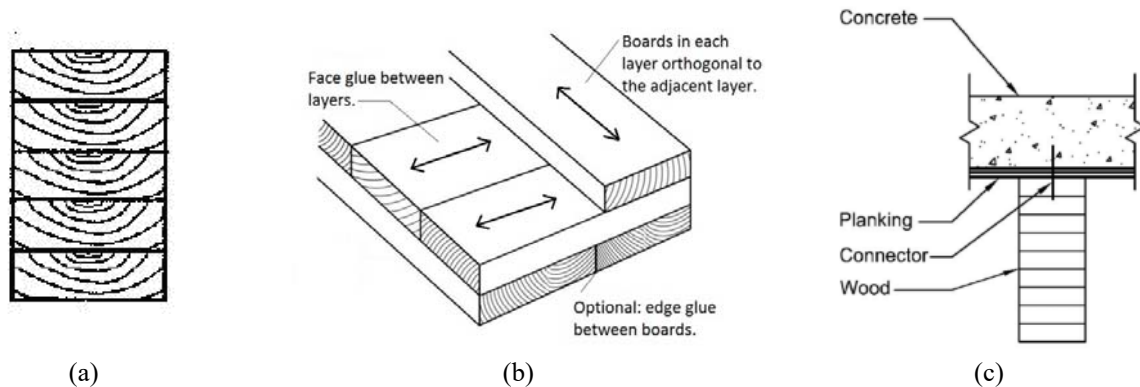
(a) Cross section of a glulam beam (BS Holz 2015) (b) Cross laminated timber layout (c) Cross-section of a TCC floor (Clouston & Schreyer 2008)
